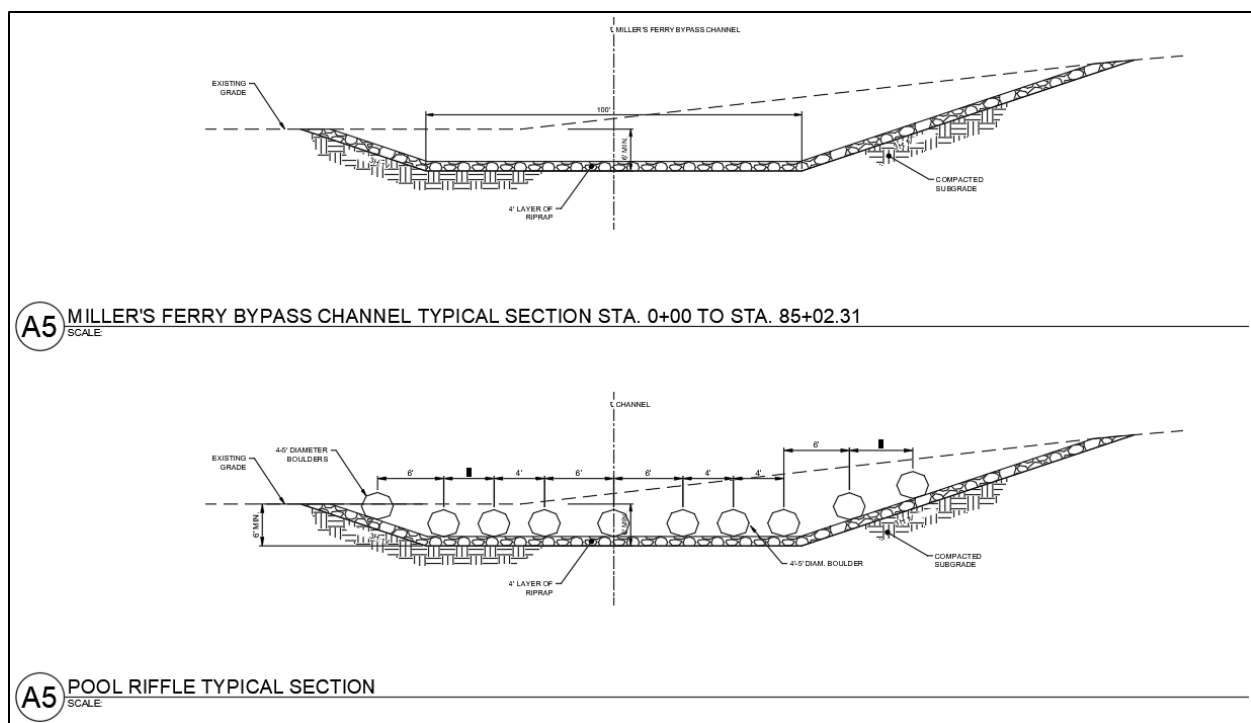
Typical Cross Section of Bypass Channel at Millers Ferry and Claiborne Lock and Dam
